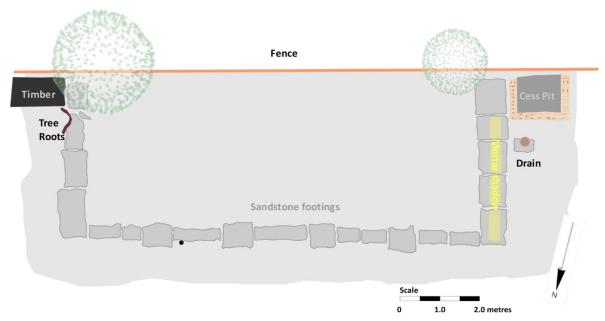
Plan of footings of Police Stables and western privy, Morpeth Courthouse.
